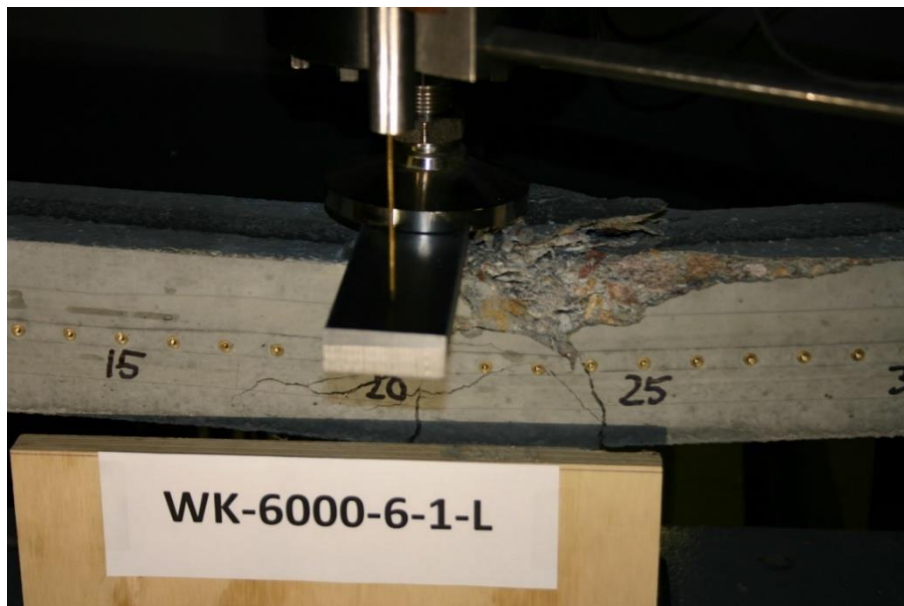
Picture of Failed Prism WK-6000-6-1-L
